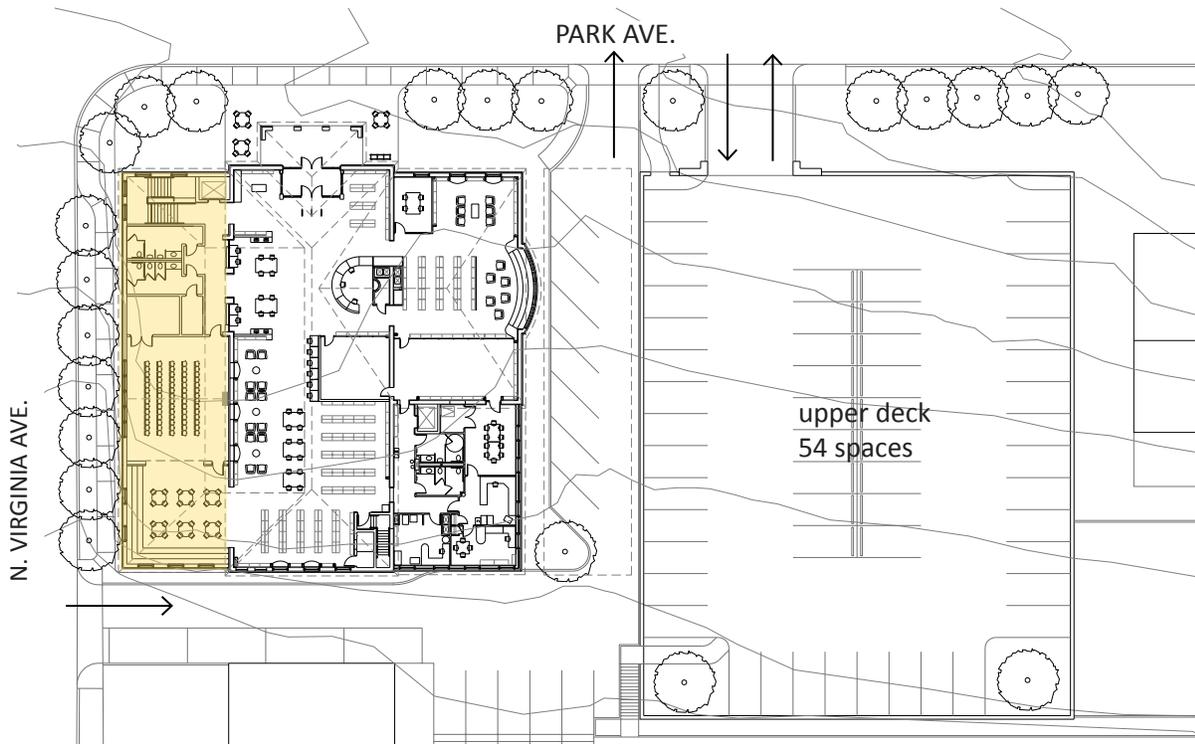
West Expansion Main Level Plan + Parking Deck
